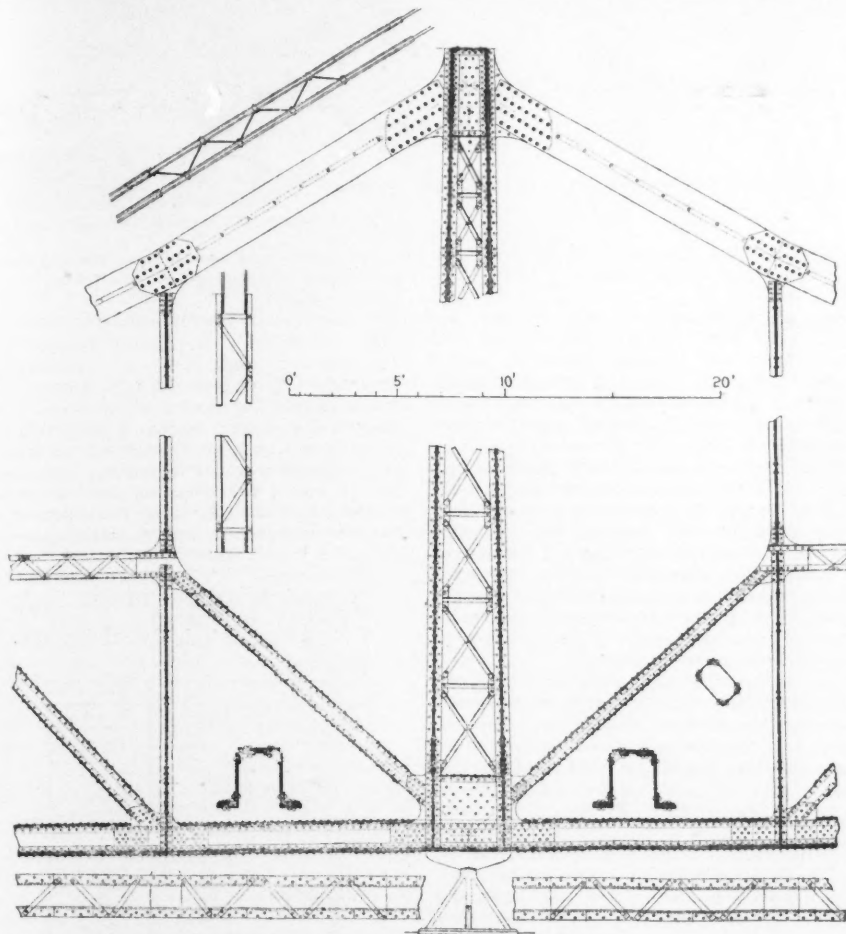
DETAILS OF "TOWER" BEARING AT PIERS AND "UPPER AND LOWER TOP CHORDS" OF CANTILEVER, THEISS RIVER BRIDGE.
